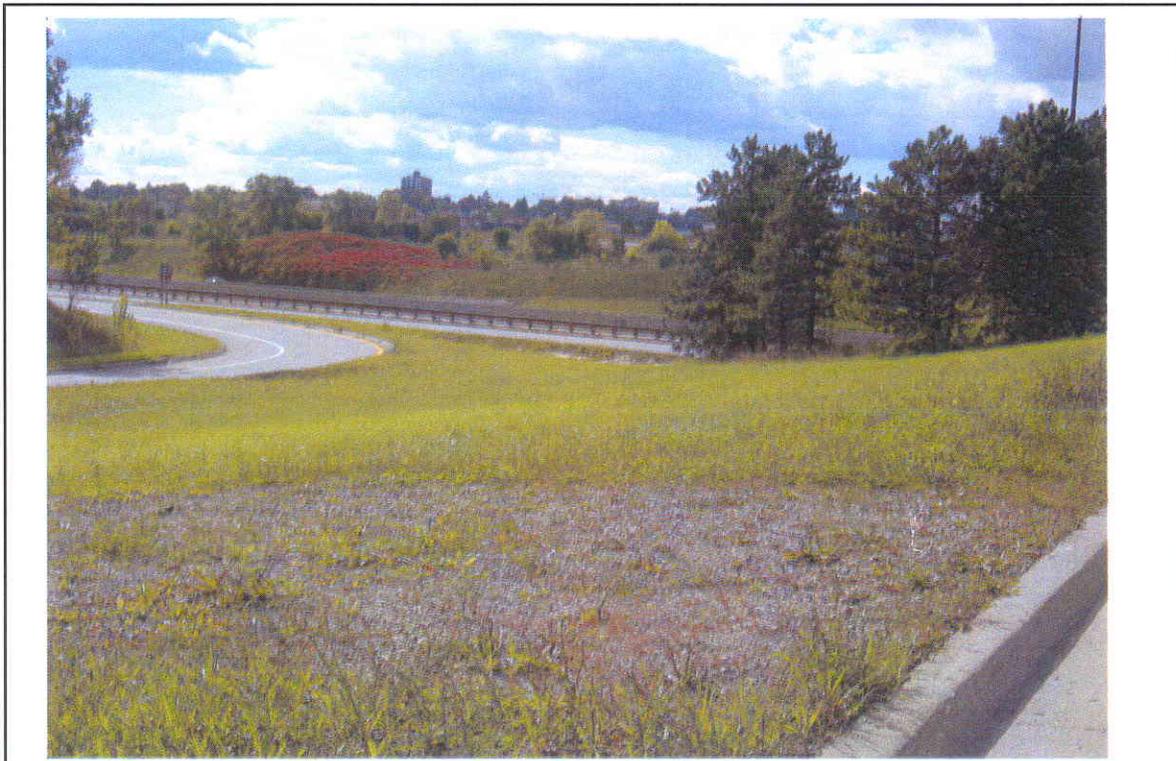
Looking at the east side of KWE and south side of Wellington Street. Borehole 08-022
